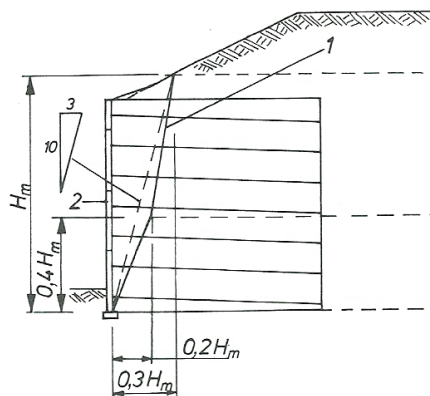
A diagram of internal stability control of reinforced soil structure – vertical cross section through reinforced massif with height H_m : 1 – dashed line showing the location of maximum tensile stresses in the reinforcement, 2 – structure casing
